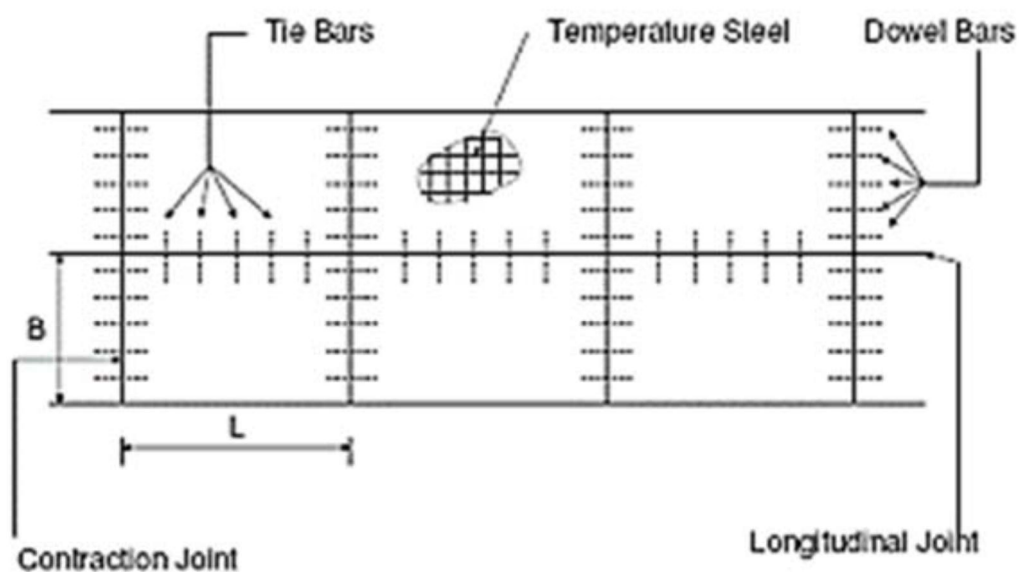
Reinforcement illustration and general appearance of concrete pavement
